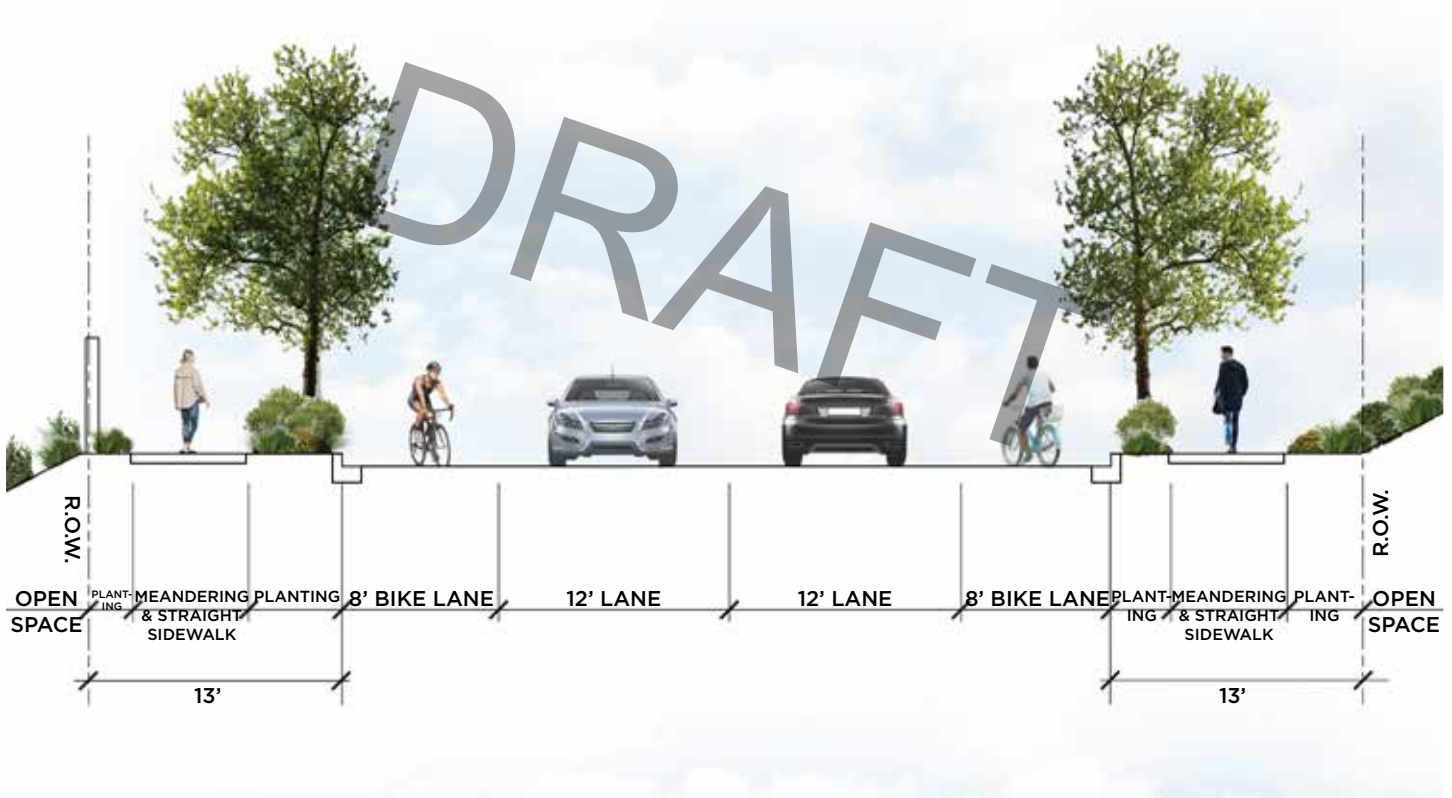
ENLARGEMENT COLLECTOR STREET SECTION J
